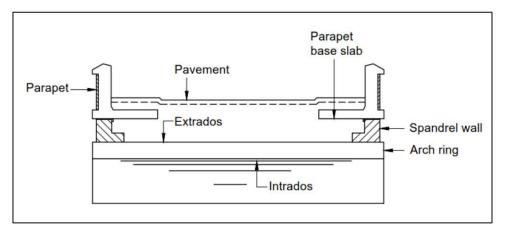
Reconstruct parapet on a masonry arch bridge (CD376 Unreinforced Masonry Arch Bridges)
